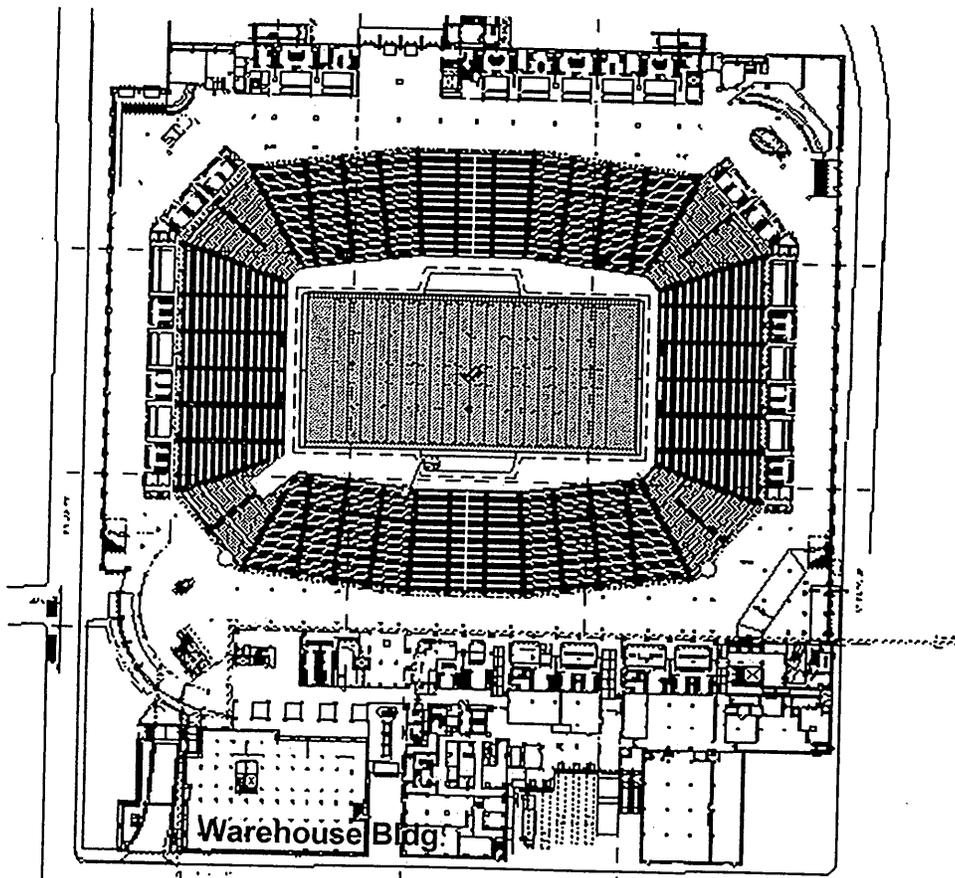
First floor - Lower Level Concourse (30 Restrooms, 25 concessions)
